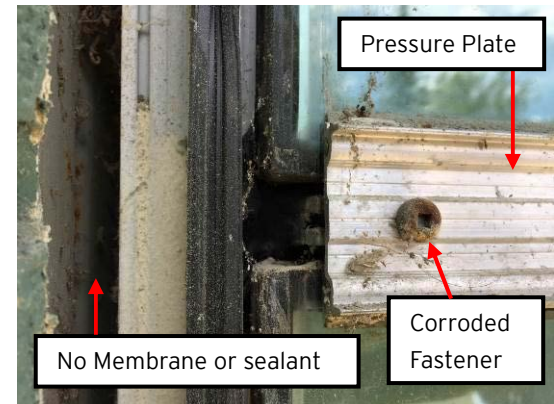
South Elevation Adjacent to Curtain Wall Windows
